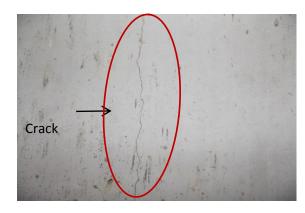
A Inclined Crack on Wall No.2 of Stair GF to UGF of (G.F.), Approx. Width = 0.25mm, Approx.Length =1.2m. Distance from Wall No. 4= 0.3m, Height from Floor = 0.2m.
